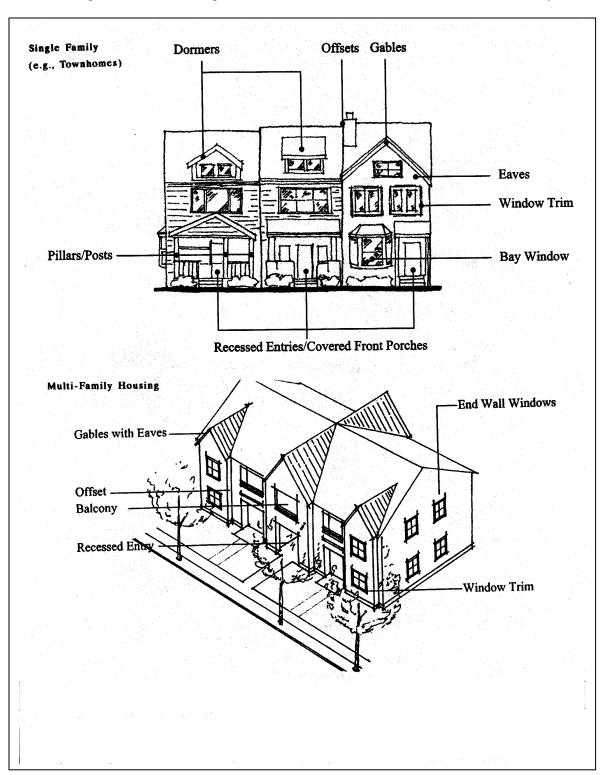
C – Examples of Architectural Details: Townhomes and Multi-Family
